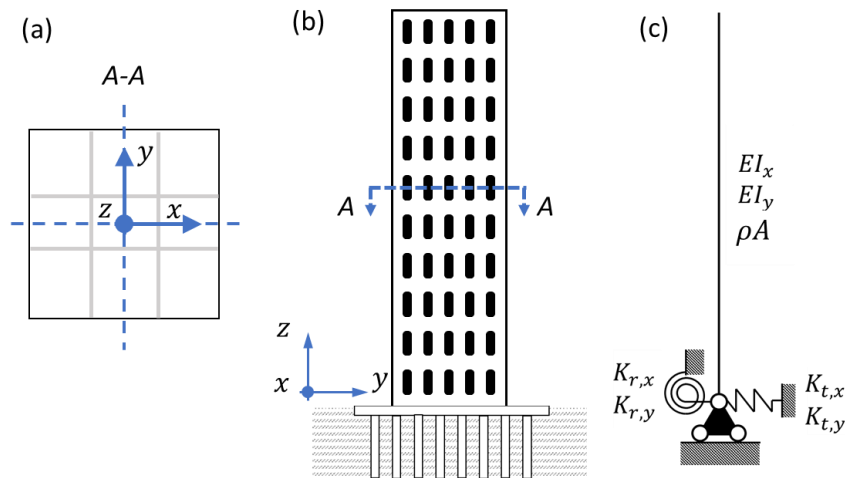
Schematic of a high-rise building and the beam model: (a) the building cross section, (b) side view of the building (c) Euler-Bernoulli beam model used to model the high-rise building.
